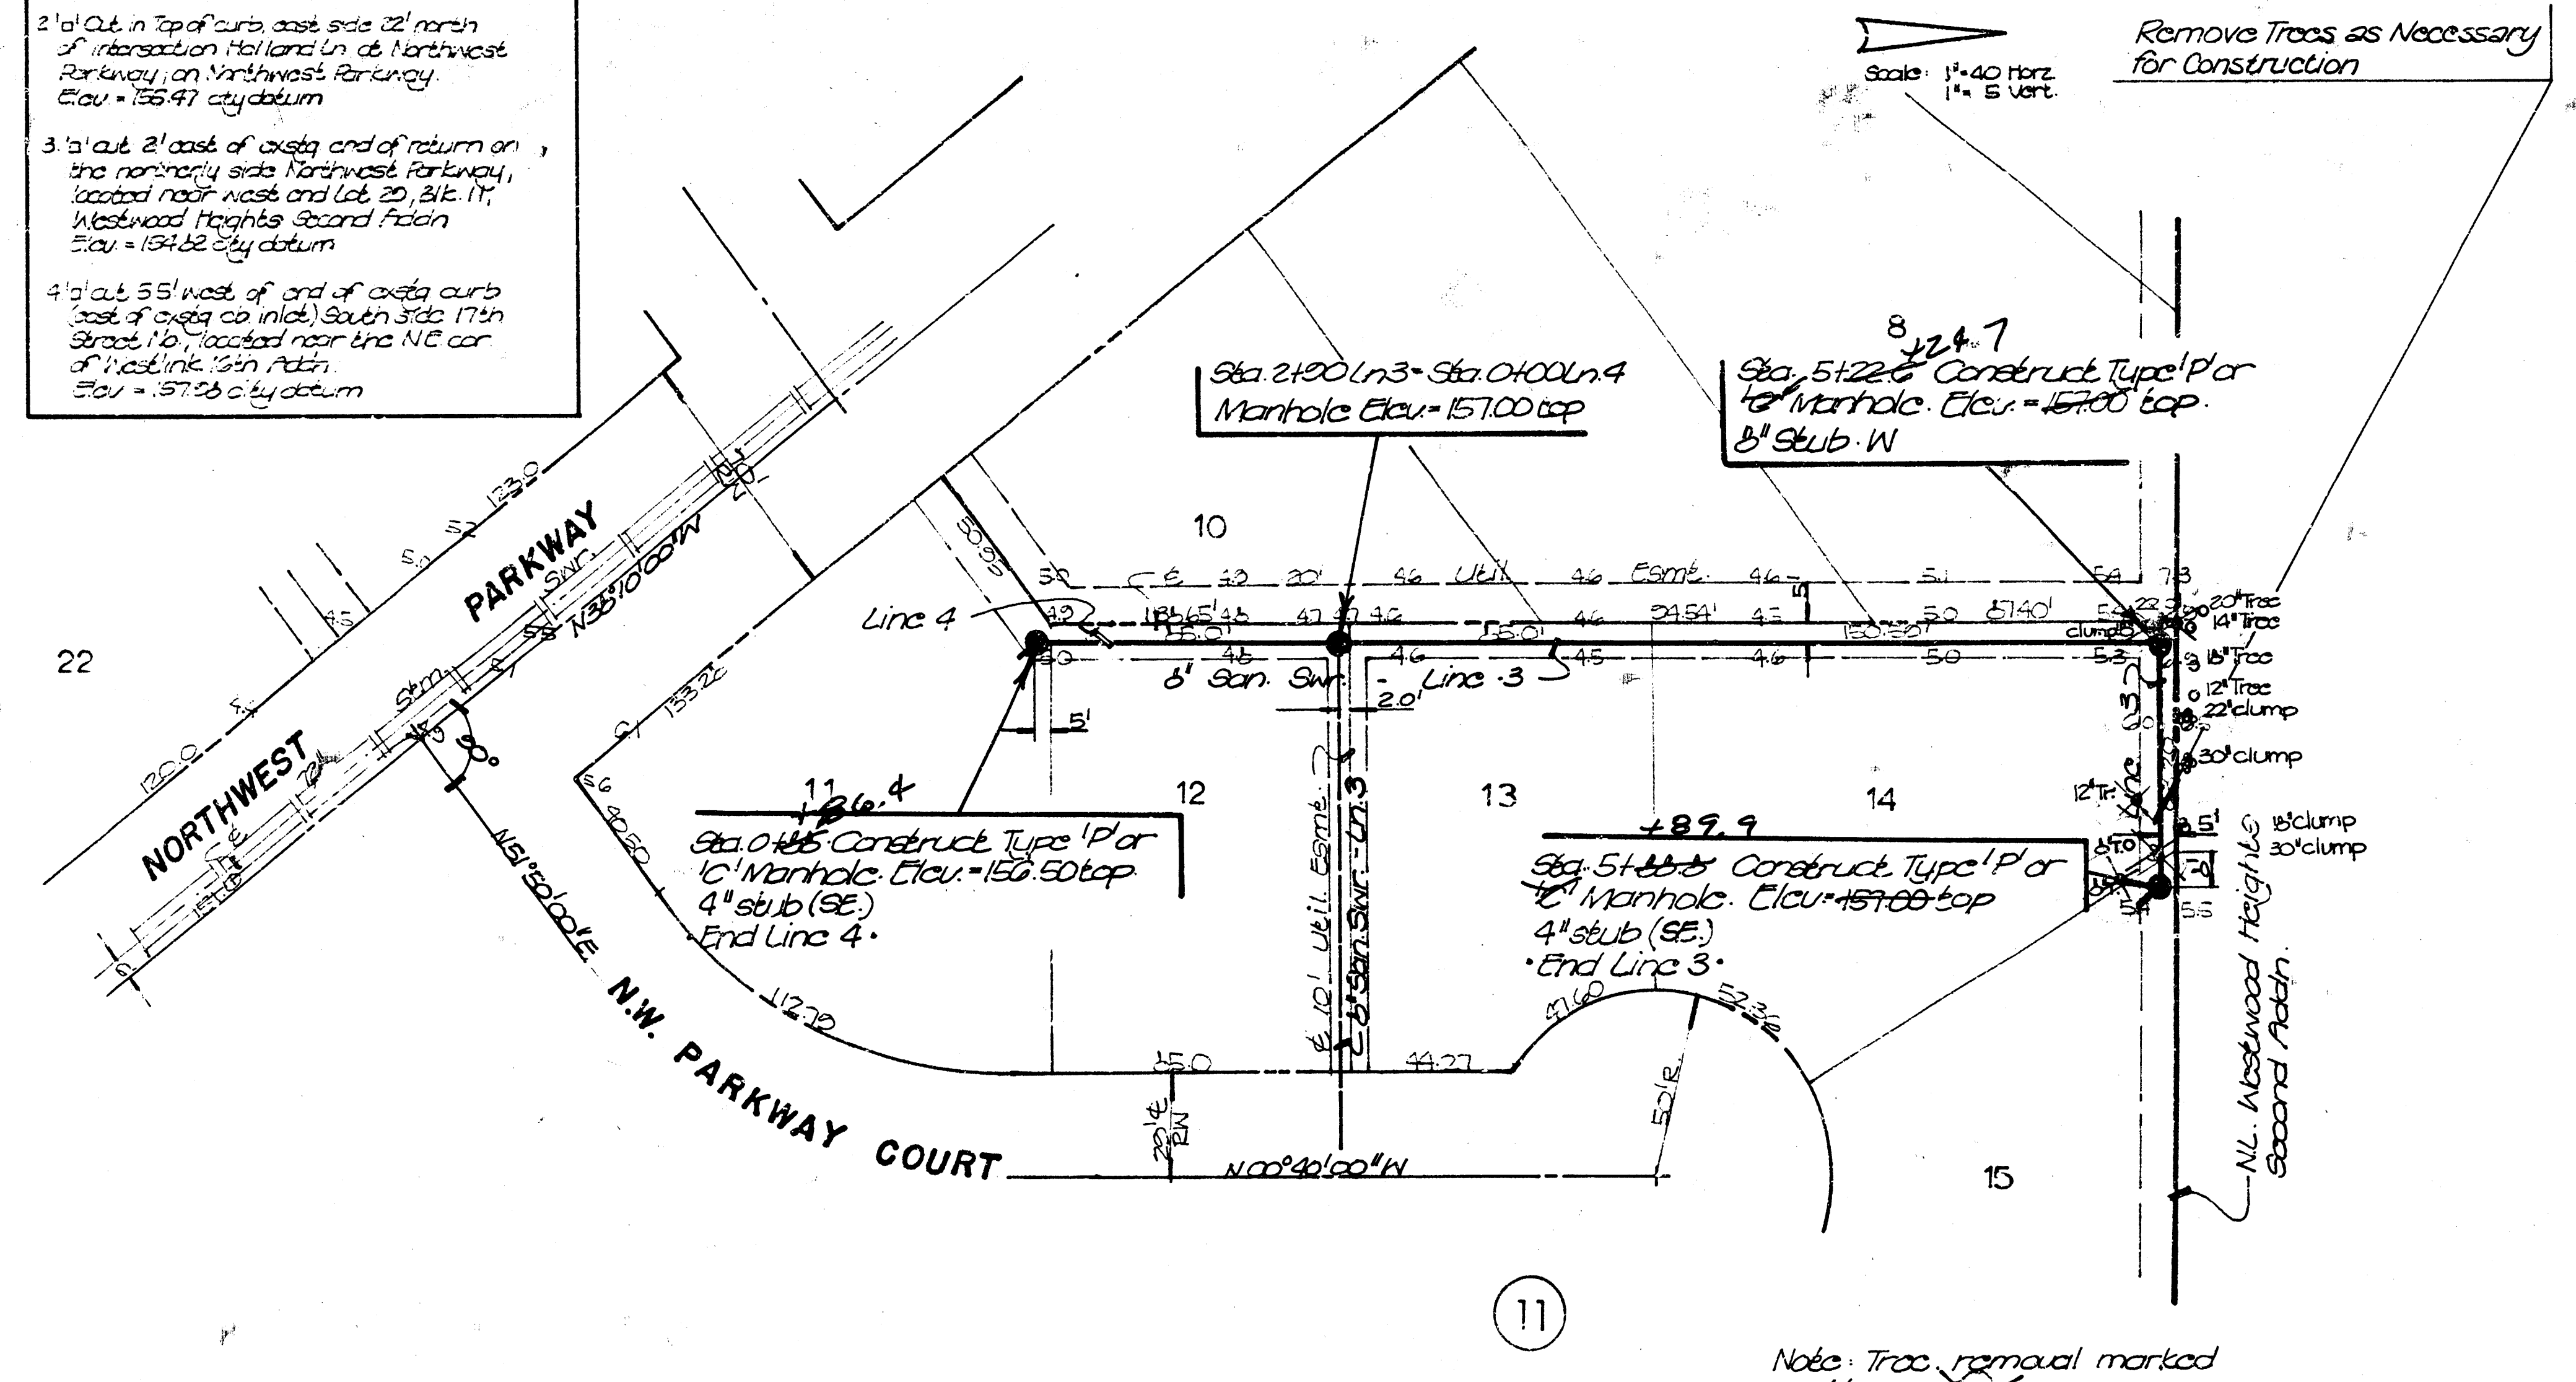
SINGLE PLAN AND PROFILE-ULL LINE
